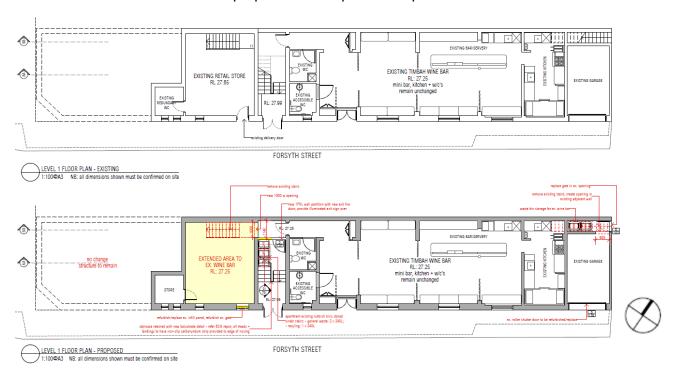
Existing and proposed lower ground (Level 1) floor plan
